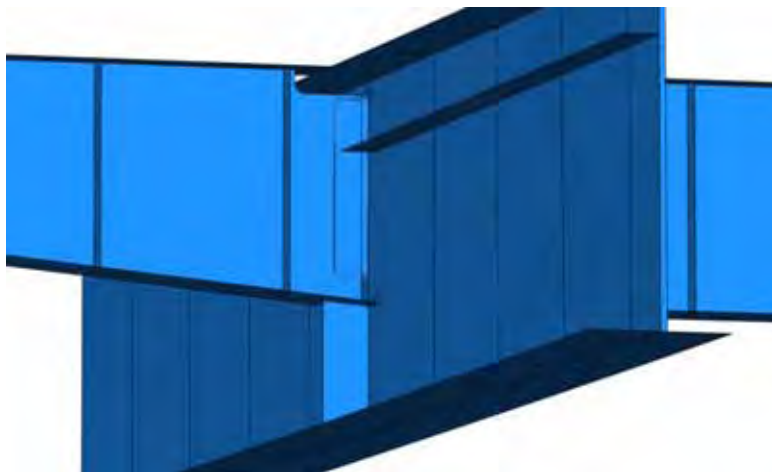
View of Connection of Floor Beam 2 to Girder 2
